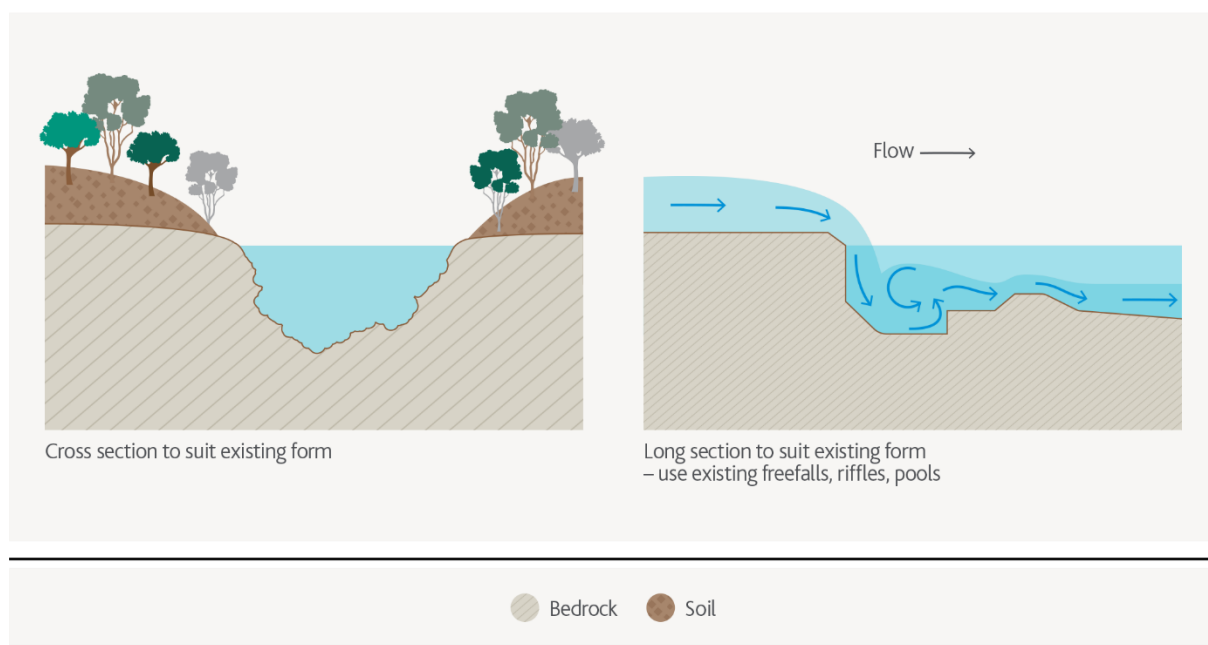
Bedrock type indicative cross section and longitudinal section profile and planform
